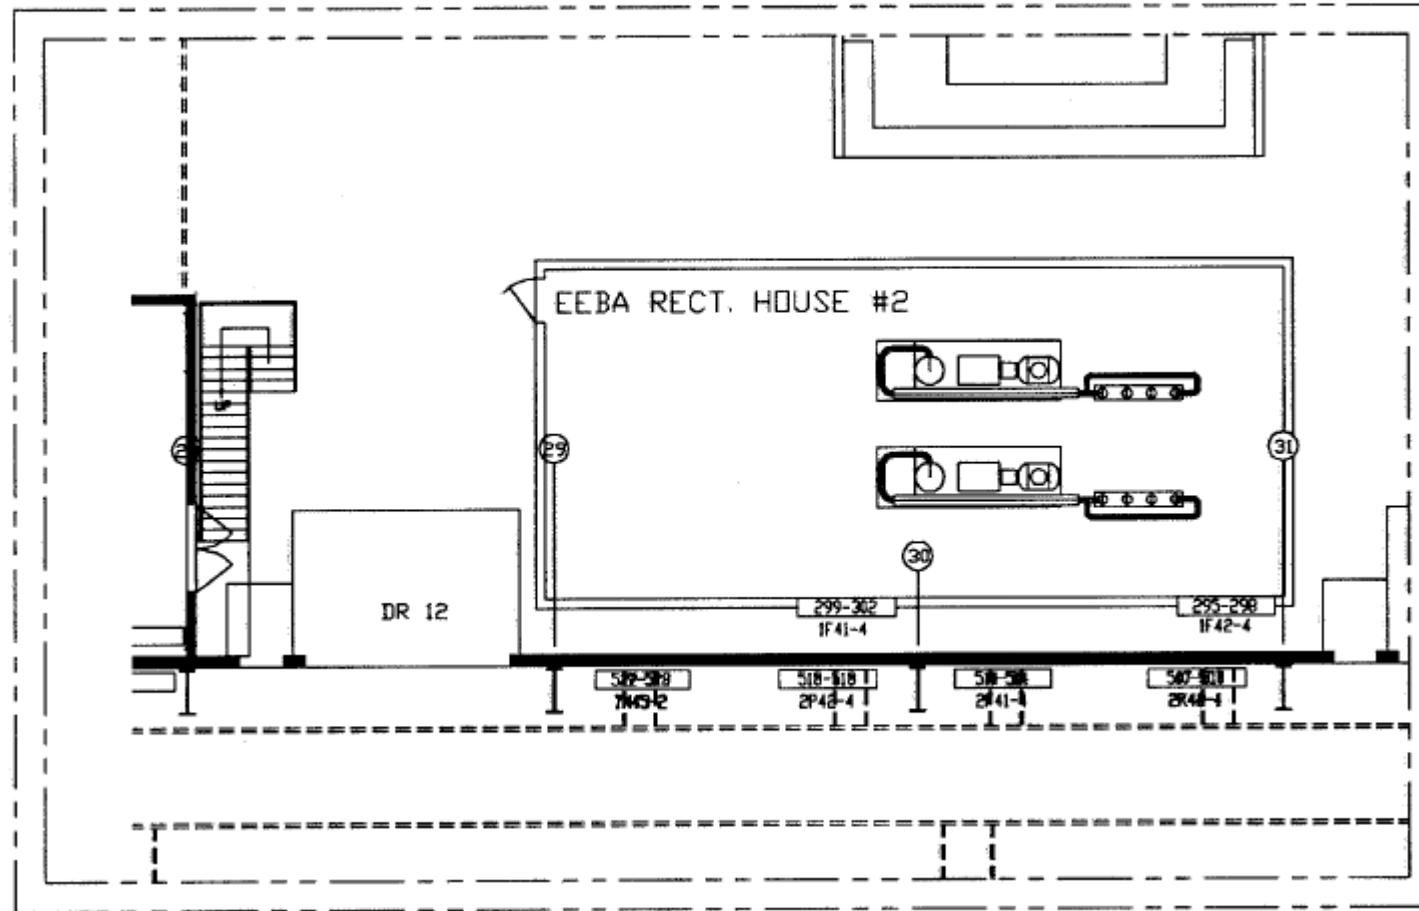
h Drawing of Prototype ERL Helium Compressor Room
